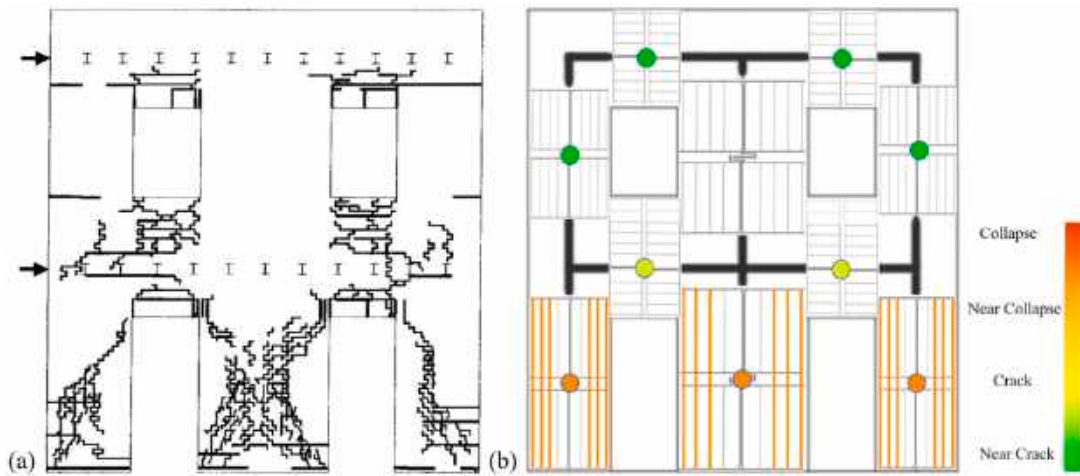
(a) Crack patterns of the Pavia door wall at the end of the test, and (b) damage representation of the wall modeled with the DM-MVLEM.
